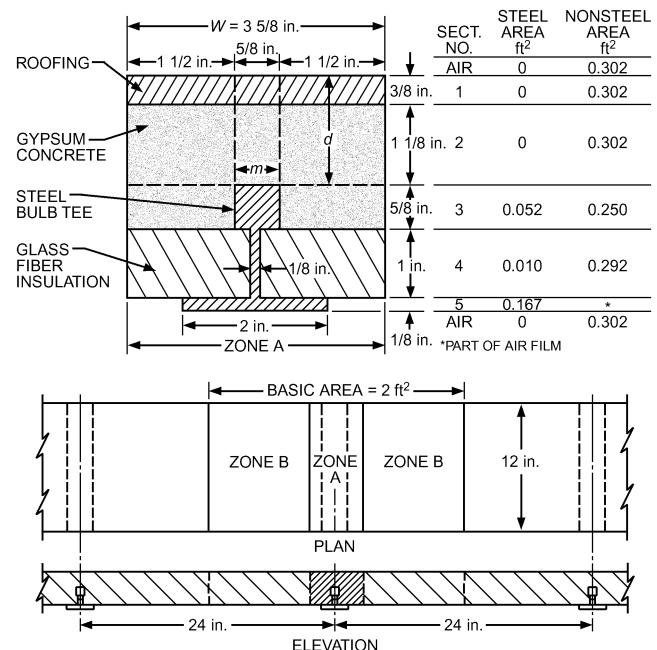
Gypsum Roof Deck on Bulb Tees (Example 6)
